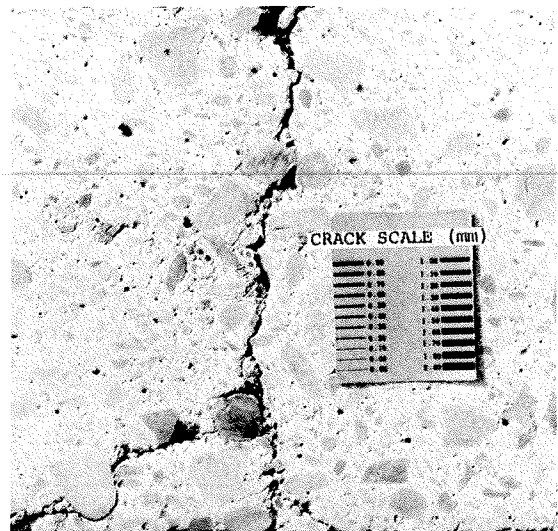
Magnified cross section under point 20 (width of crack expanded because of abrading action).
